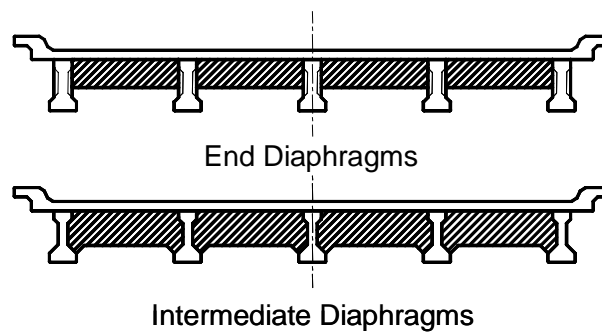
Diaphragm Details for Wimberley Bridge (Wagener 2002)
